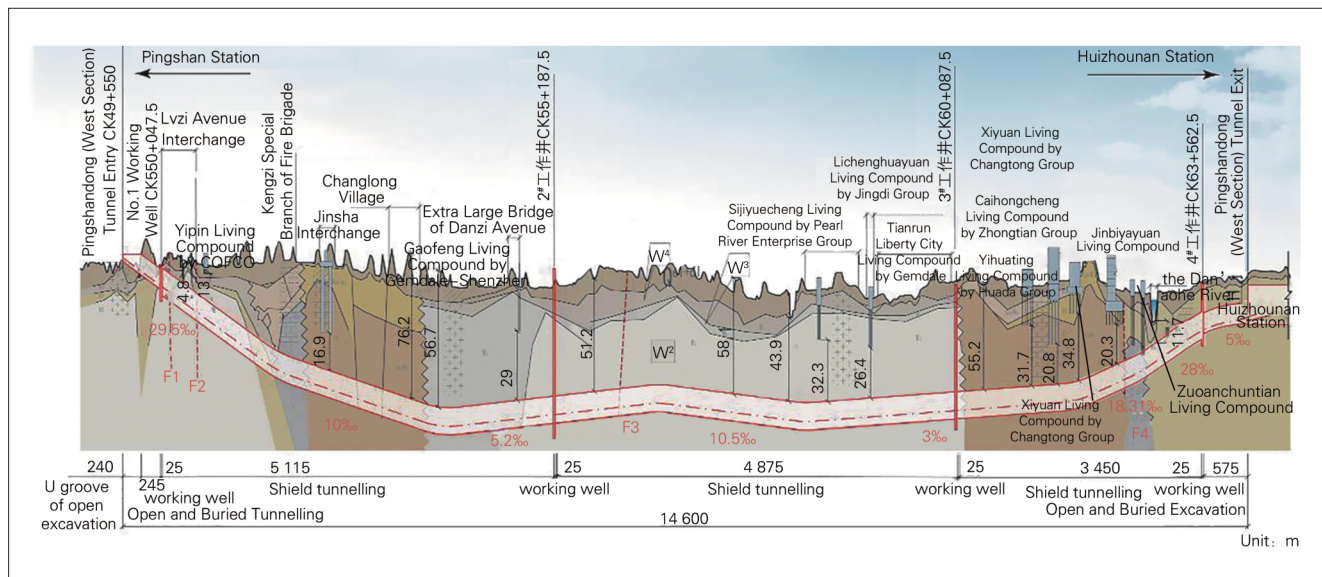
The Vertical Section of the Pingshan-Shenzhen Section of Shenzhen-Shanwei Railway
